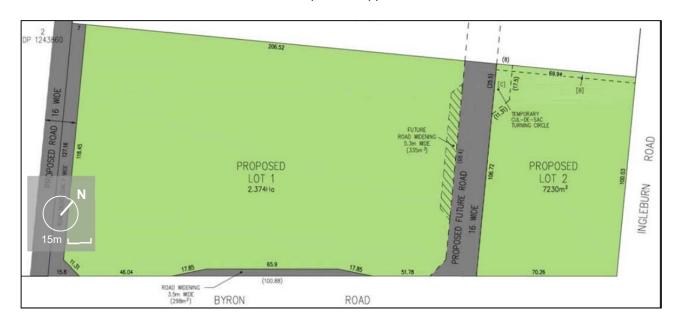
| Proposed subdivision (Source: Applicant's EIS 2019)
